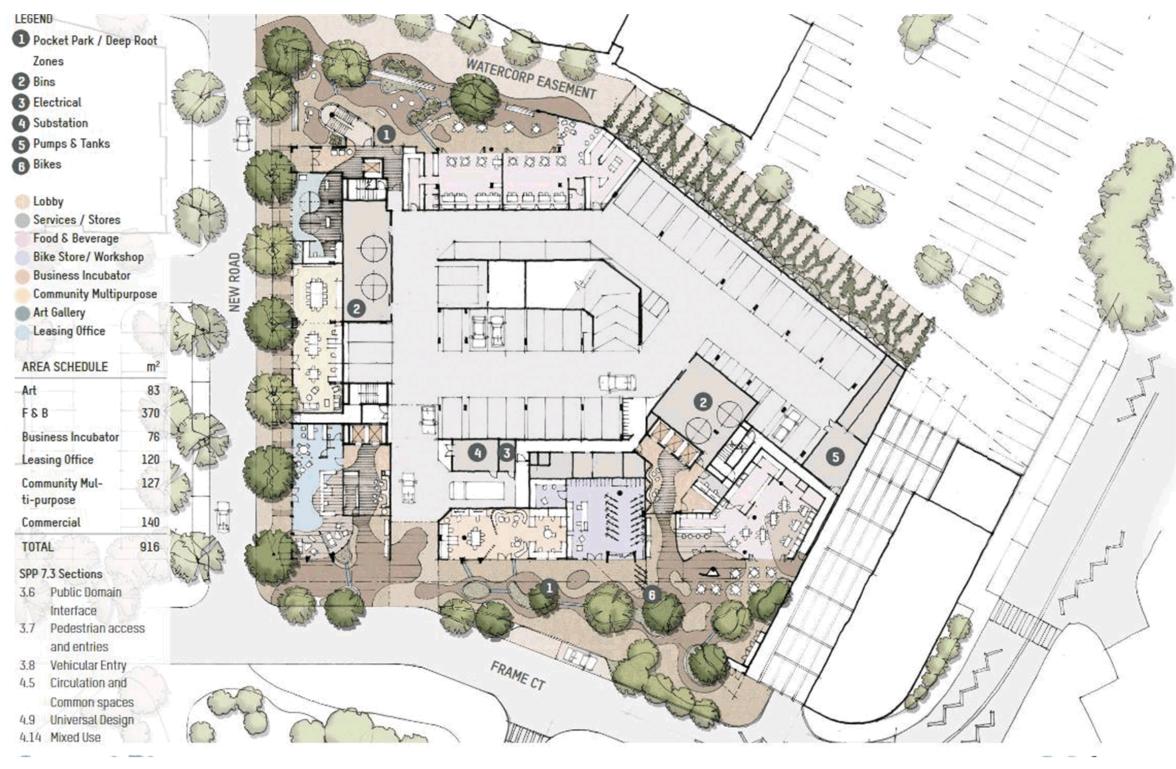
Ground level layout plan – 40 Frame Court LDP as submitted
